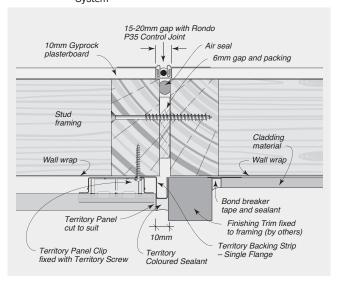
Typical Junction Detail with Fibre Cement Cladding System
